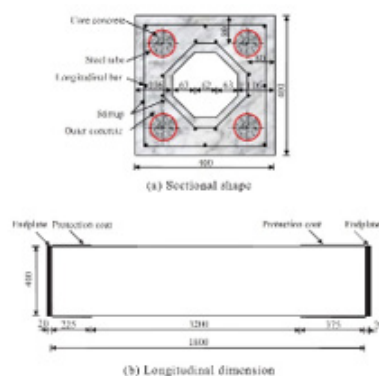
The proposed Concrete-Encased Concrete-Filled Steel Tubular (CECFST) box specimen by Hou et al. [177], where (a) is cross section and (b) is the longitudinal dimension of the specimen.
